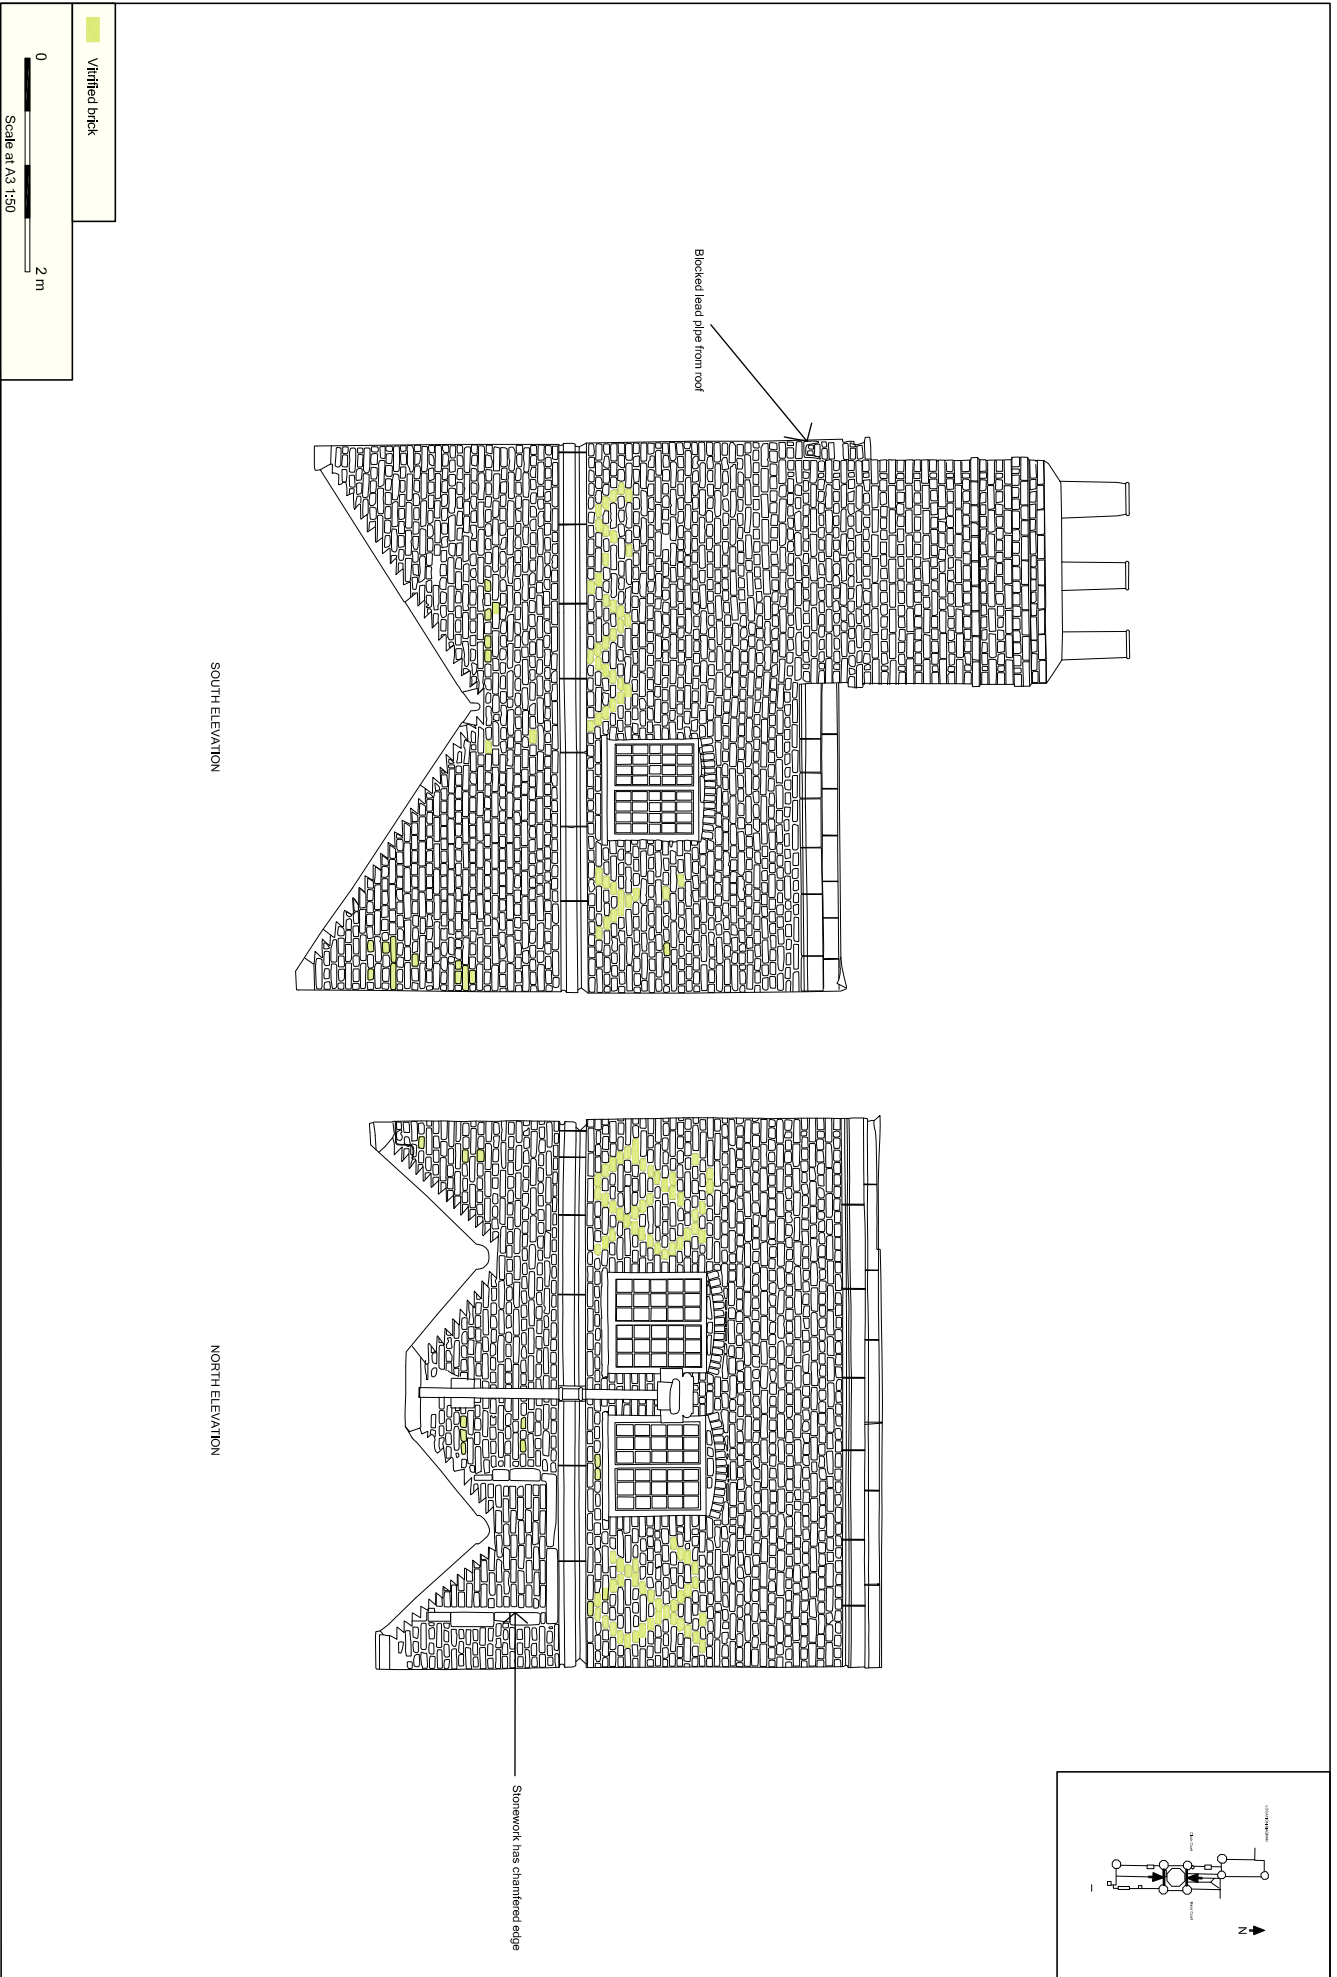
Anne Boleyn Gatehouse, North and South Elevations - Diaperwork and Other Details
